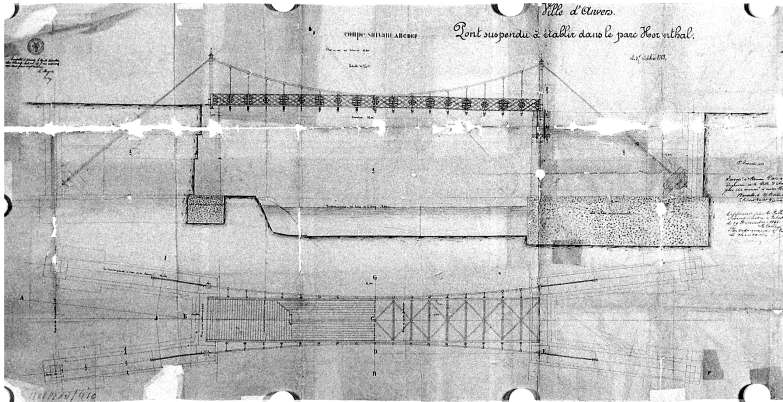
Original plan and elevation. Iron suspension bridge in the park at Antwerp. 1868. (Archive Antwerp).
